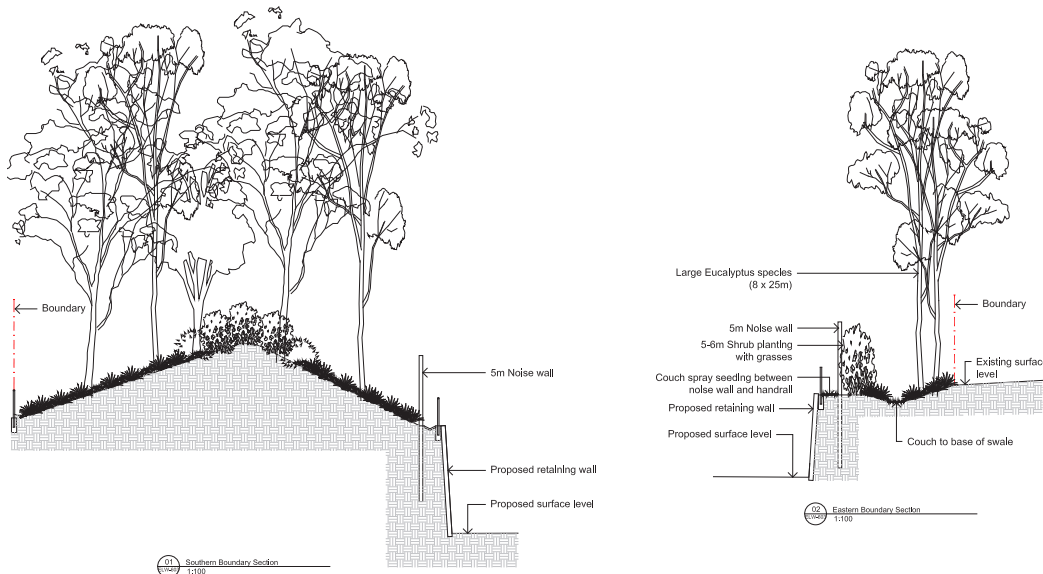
Boundary detail at the south and east of the Site (source alt 2018)
